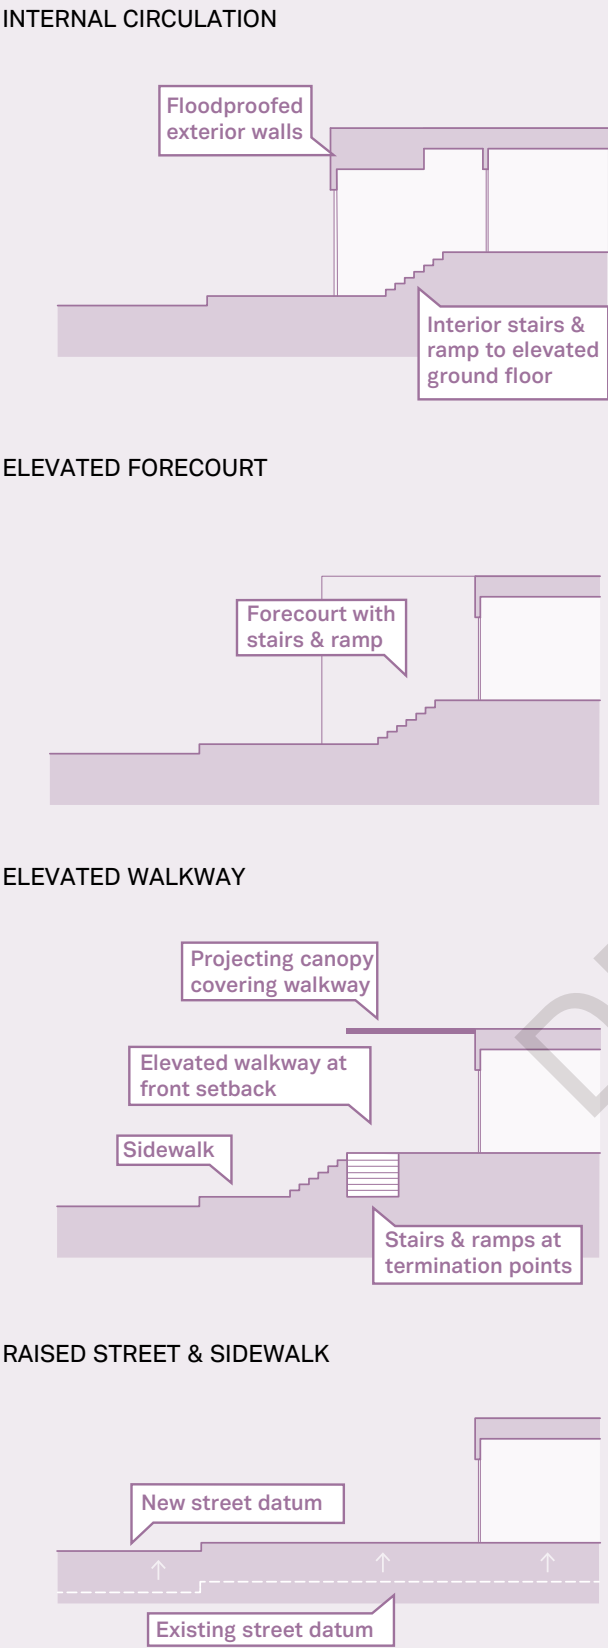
Strategies for public access to elevated ground floor spaces in flood-prone areas.
